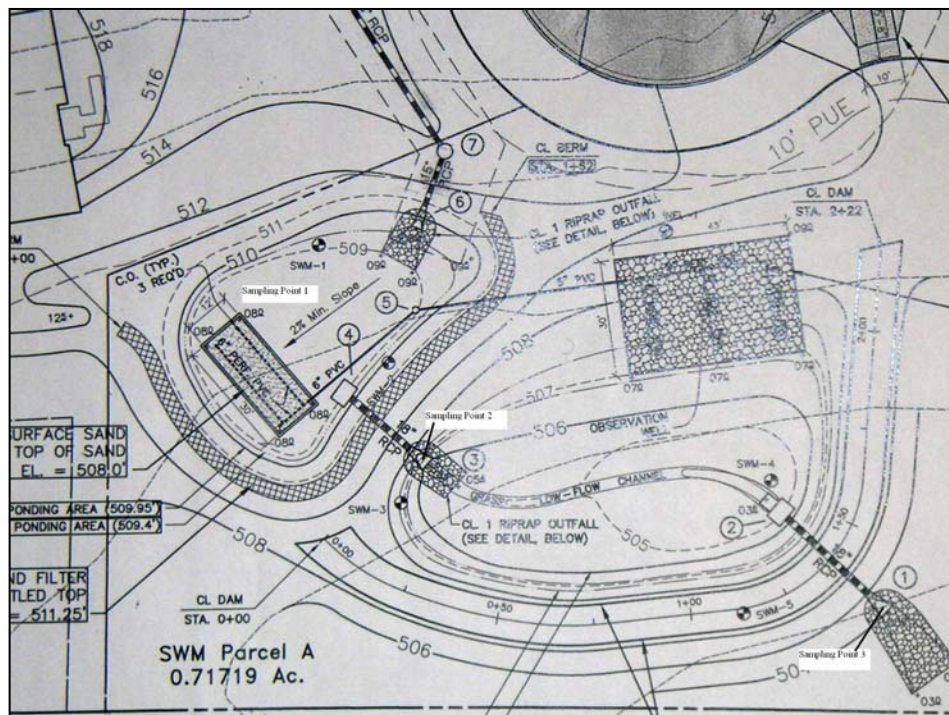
Plan view of Snider's Estates SWM with marked sampling locations (Jones & Schreiner 2008). The plan illustrates during construction / pre-conversion sampling points (3) and the discussed post-construction flow monitoring station (Sampling Point 2).
